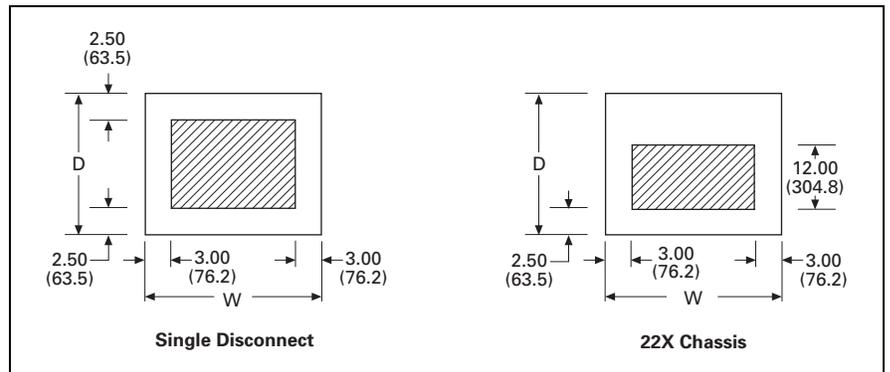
Typical Conduit Areas—Bottom Cable Exit
